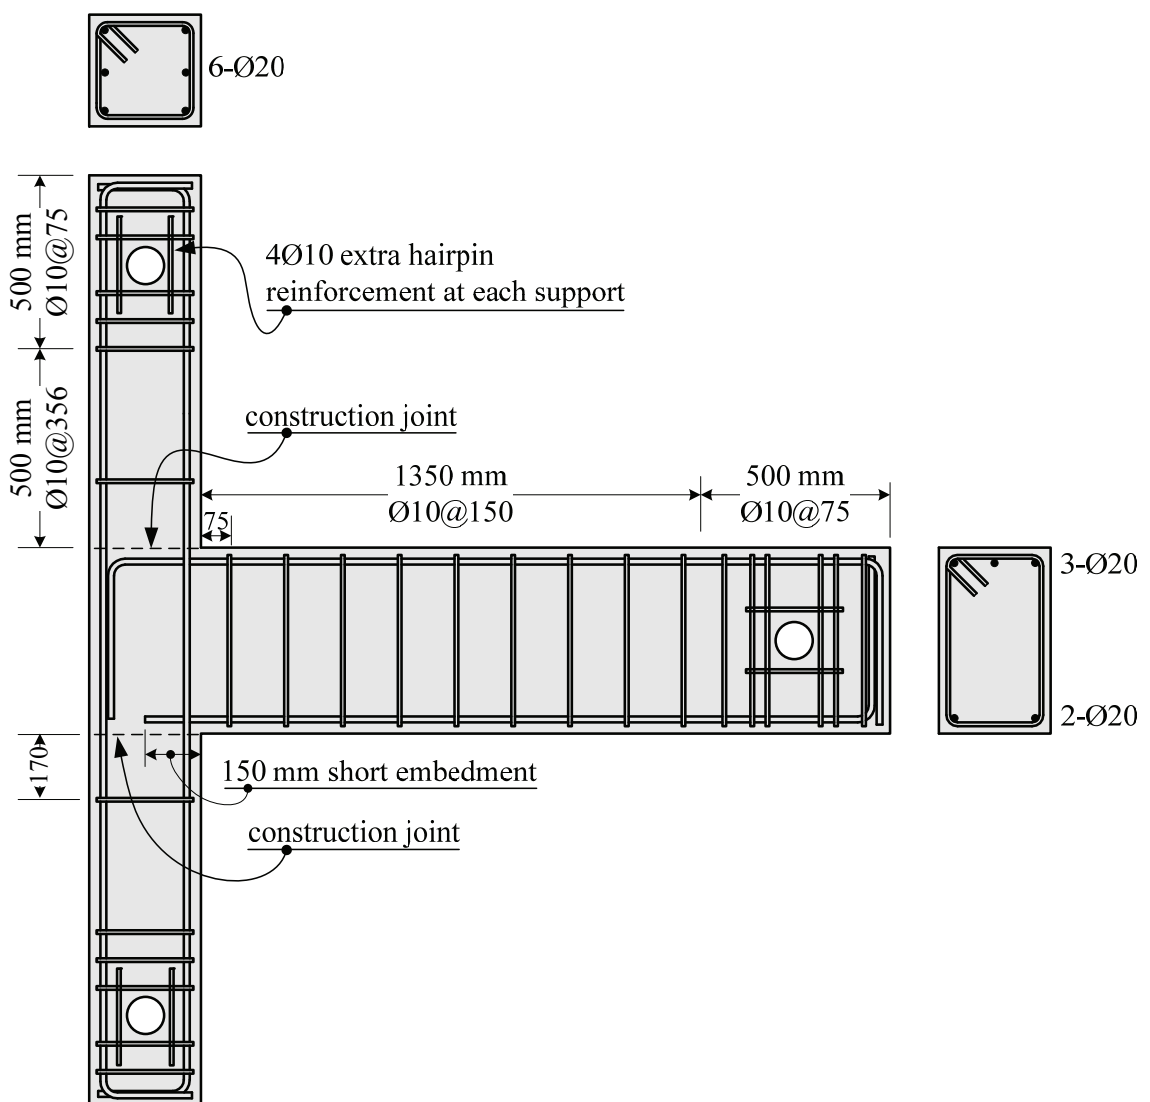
Steel reinforcement detailing of US2, US2-FRP2 and US2-R-FRP2
